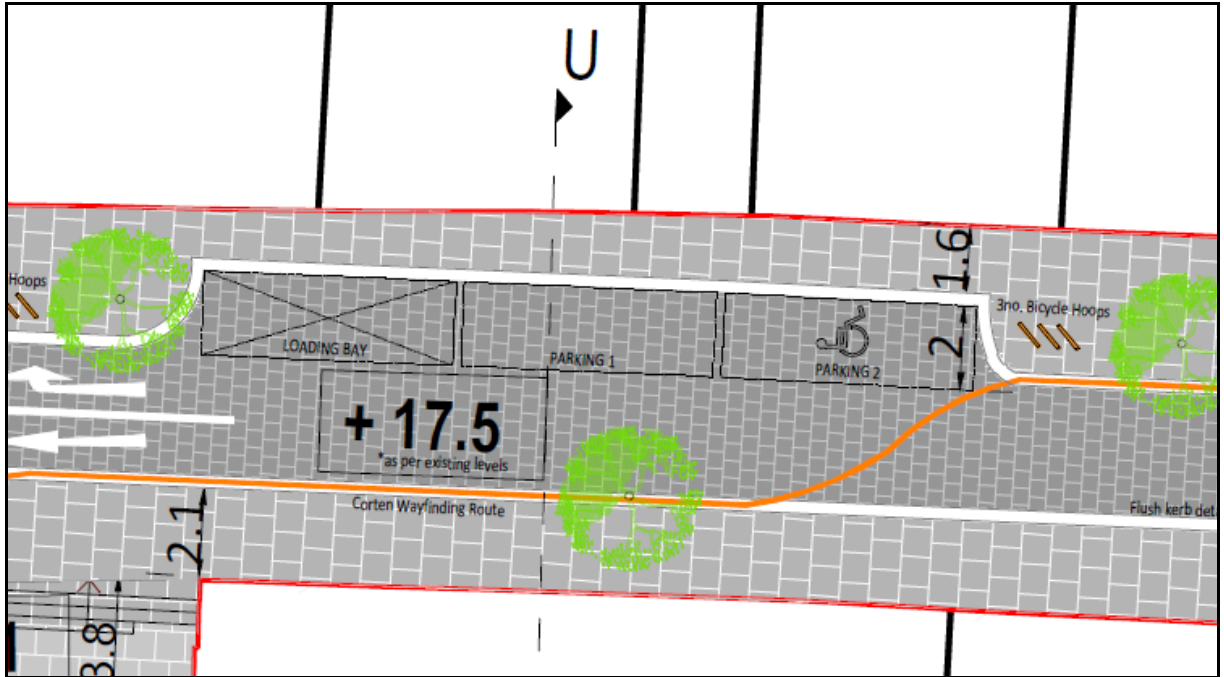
Narrow proposed disabled bay on Fair Street with narrow footway adjacent
